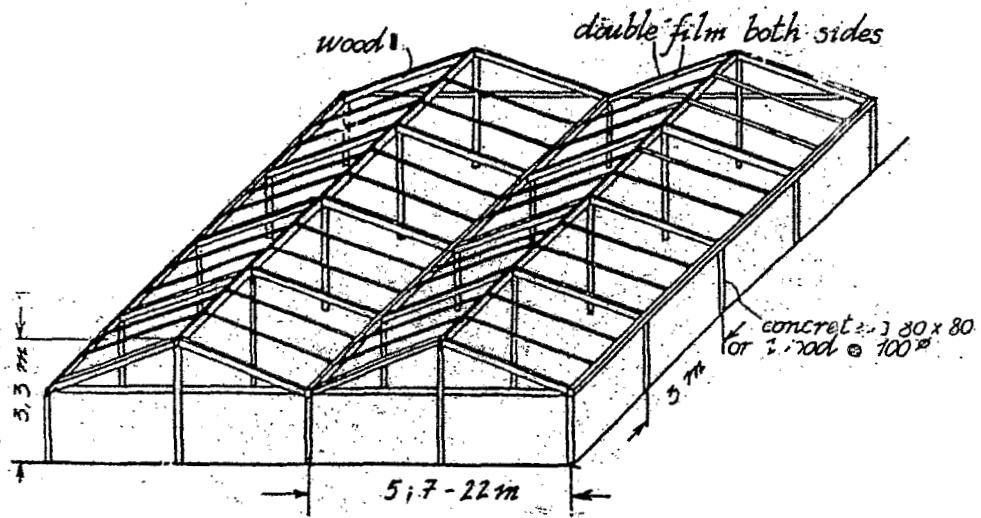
A saddle roof greenhouse type used in Sicily (FAO book).
